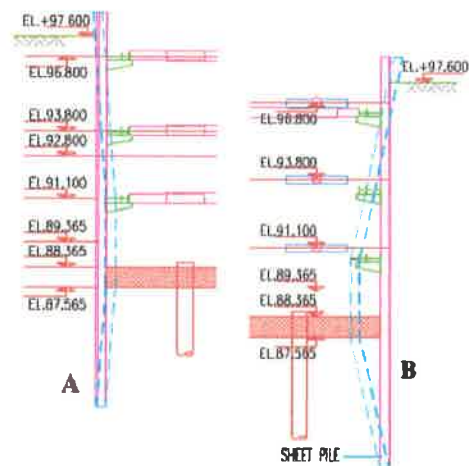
Deflected sheet pile compare to as build drawing A) on South site near SW-2, B) on West site near SW-1
